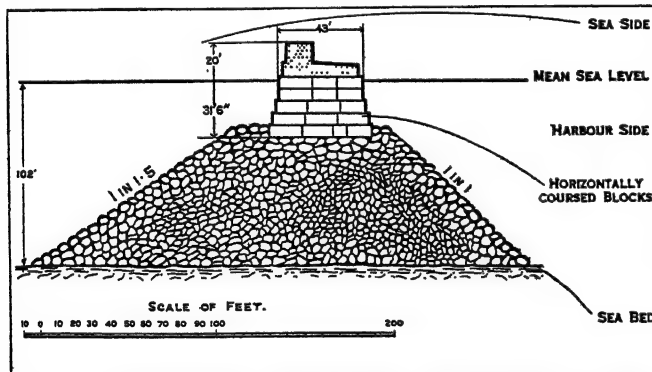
CROSS SECTION OF THE ANTE-MURALE BREAKWATER AT NAPLES HARBOUR
